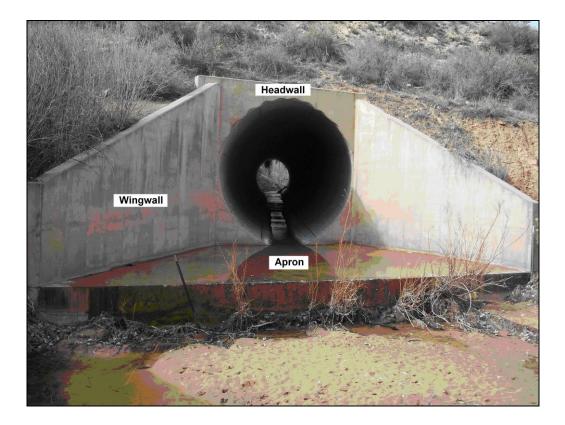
Culvert Headwall, Wingwalls and Apron
